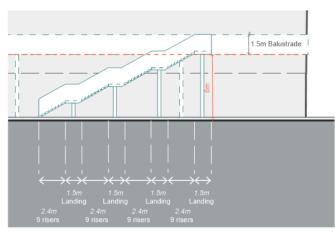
6m Height Stair, Elevation (typical plan see section 7-1 fig.14)
